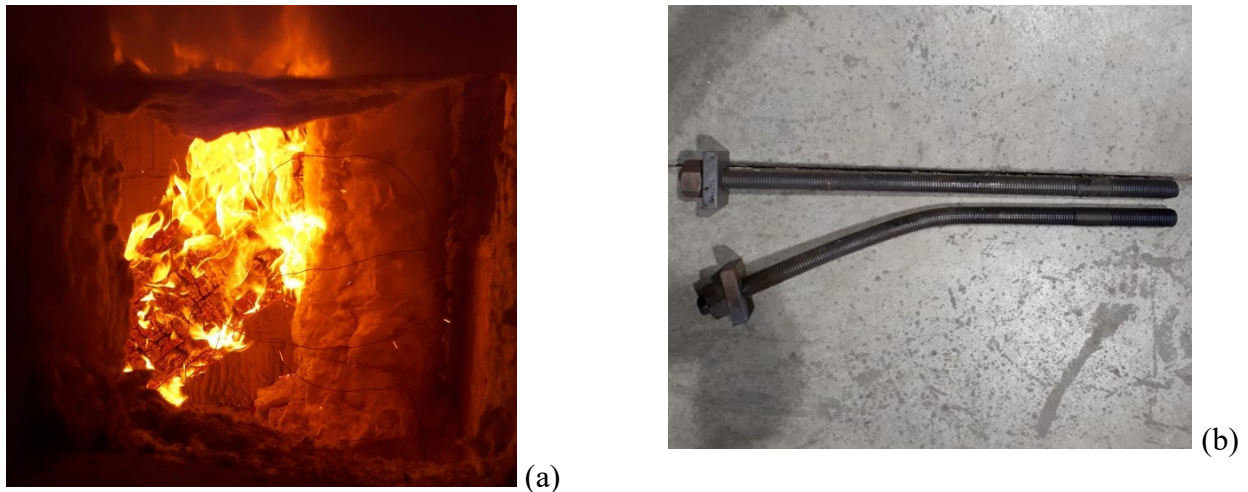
Test-BCF 200-2.0-B after failure: (a) Connection just after failure; (b) Steel rods after failure.
